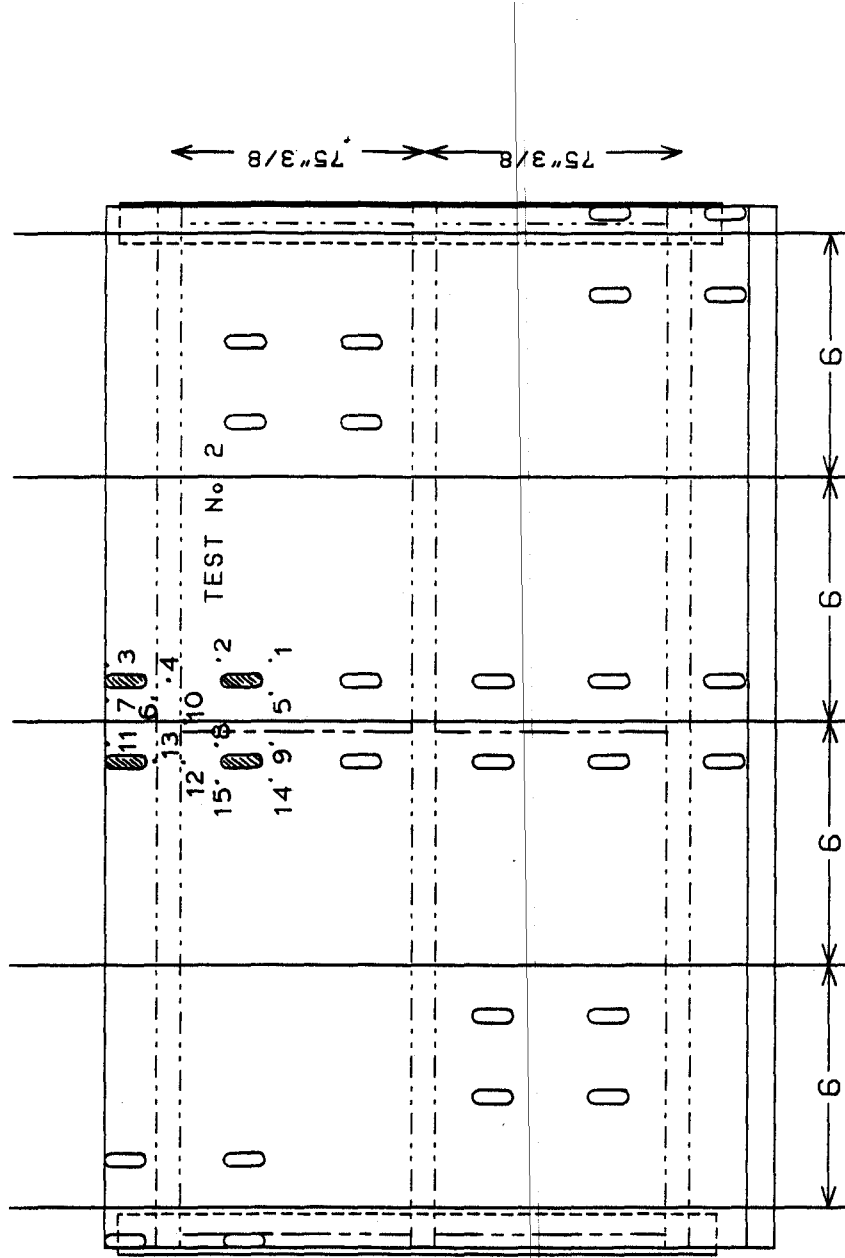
LVDT Locations (Second Bridge - Test No. 2)
